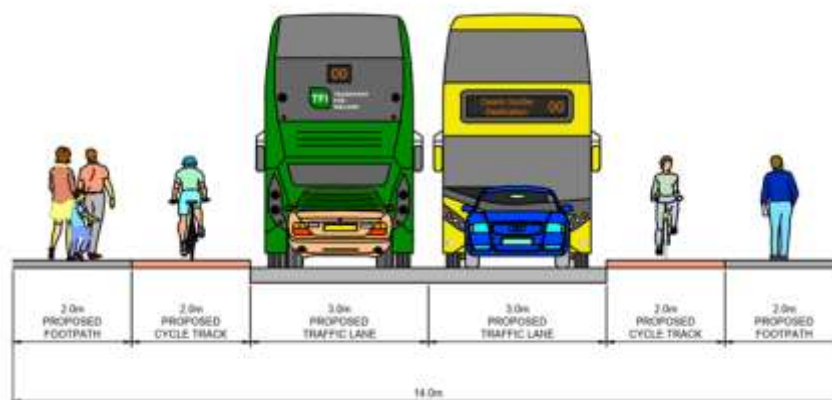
Typical Traffic Management Cross Section (A - A)
